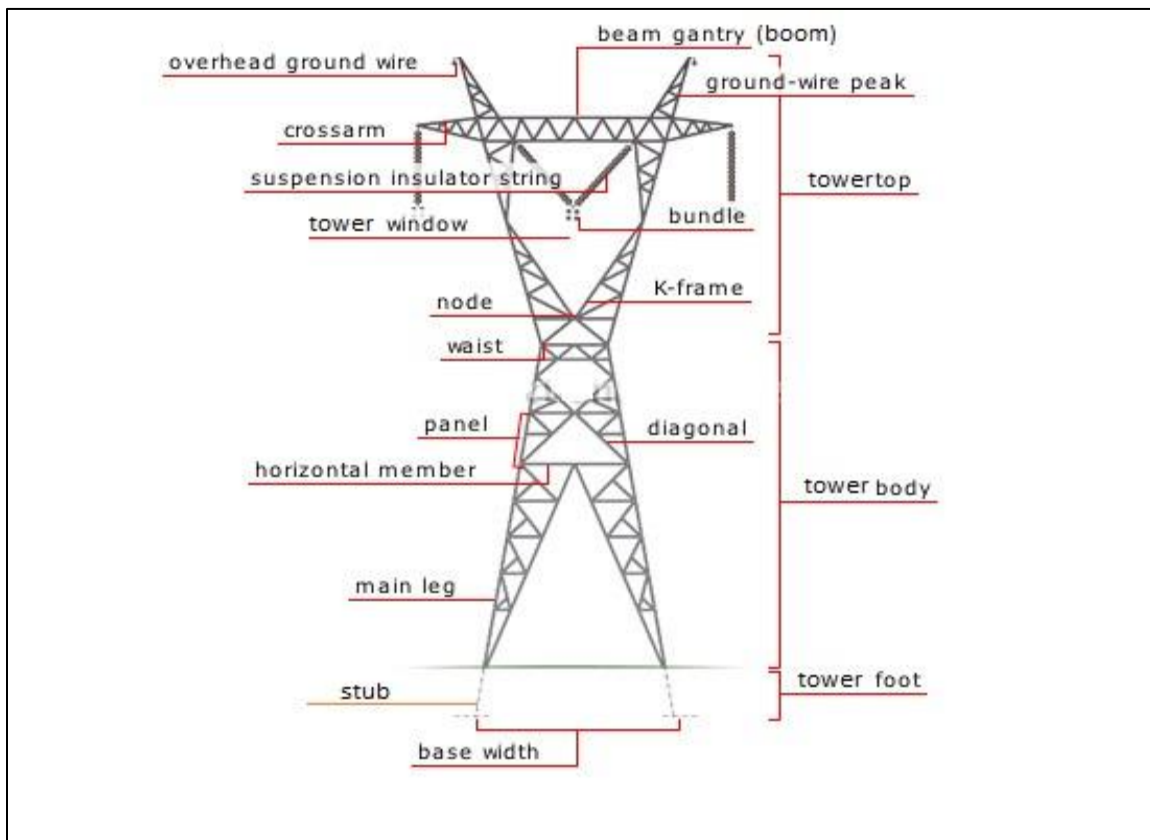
Tower Anatomy - Horizontal Type Tower
